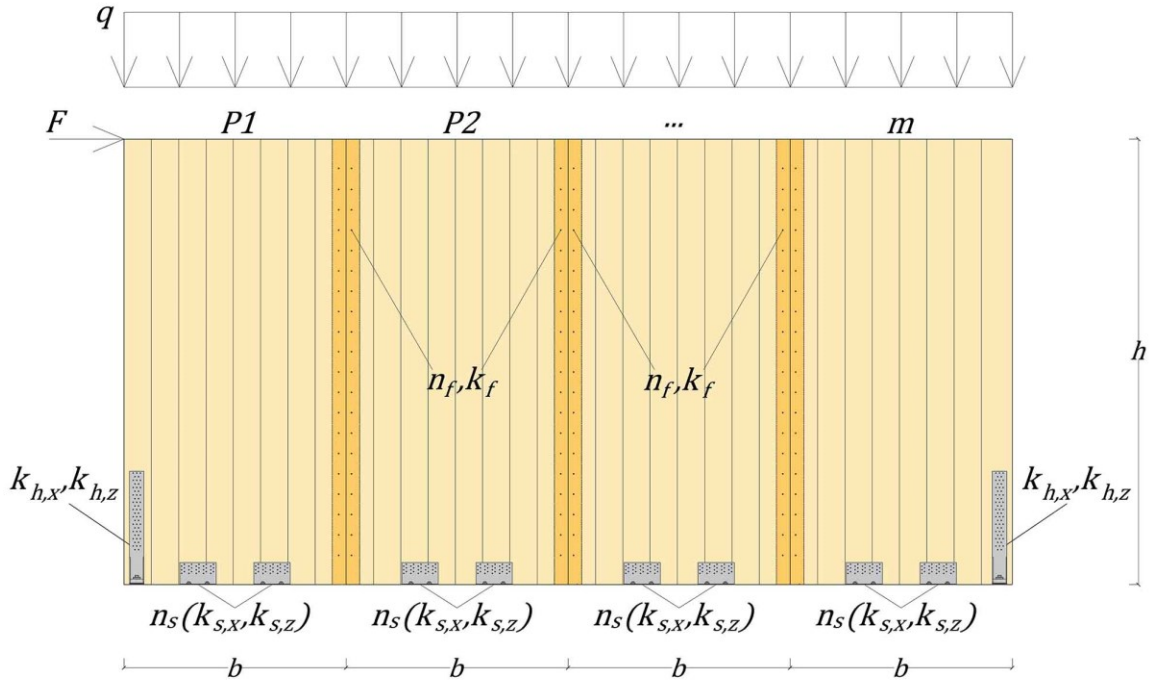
Multi-panel CLT shearwalls with typical connection and loading configuration
